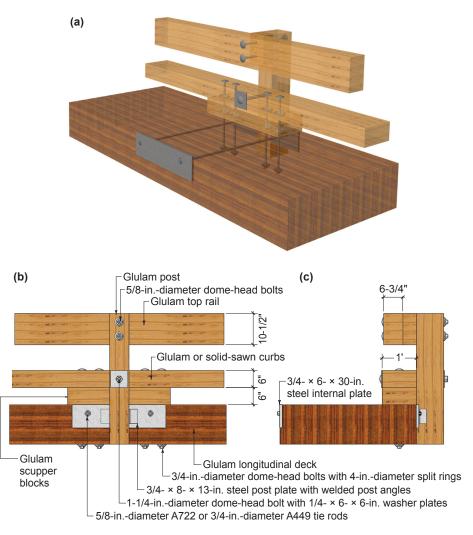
Glulam crash-tested railing option for longitudinal bridge decks meeting (NCHRP-350) test level 2 requirements: (a) perspective view; (b) outside profile view; (c) end view.
